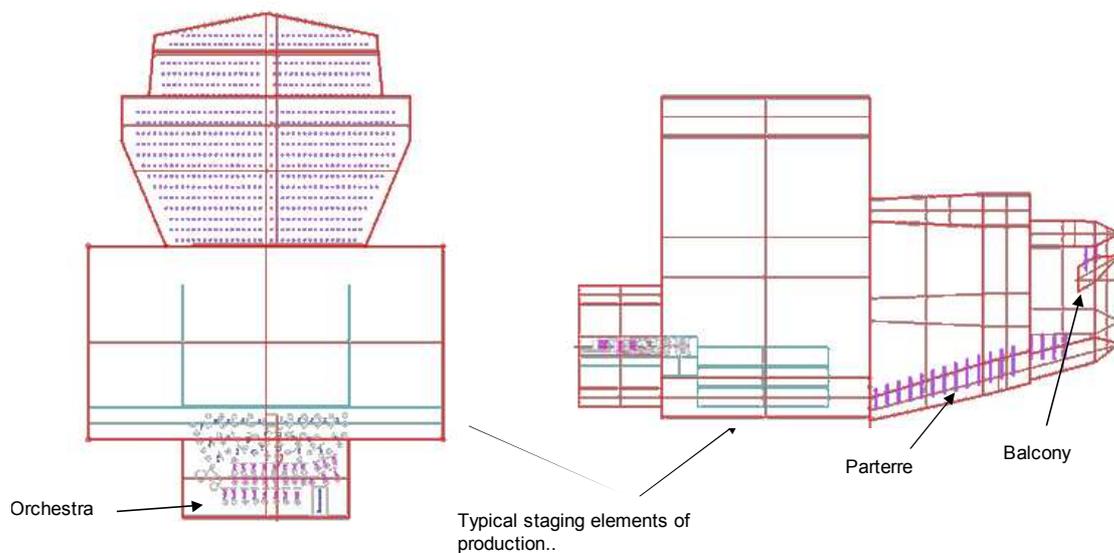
Plan and cross section of the theatre with the scenic set-up.
